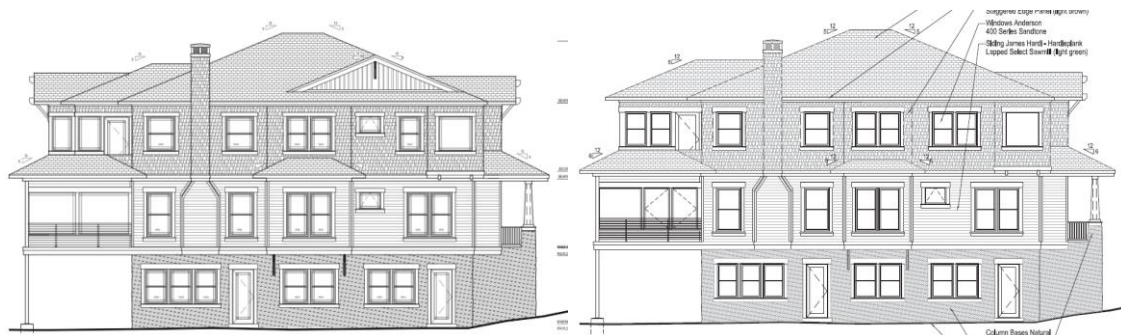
East elevation showing May 2019 submission (left) with current proposal with removed gables in the roof and reduced 1st floor bay.
